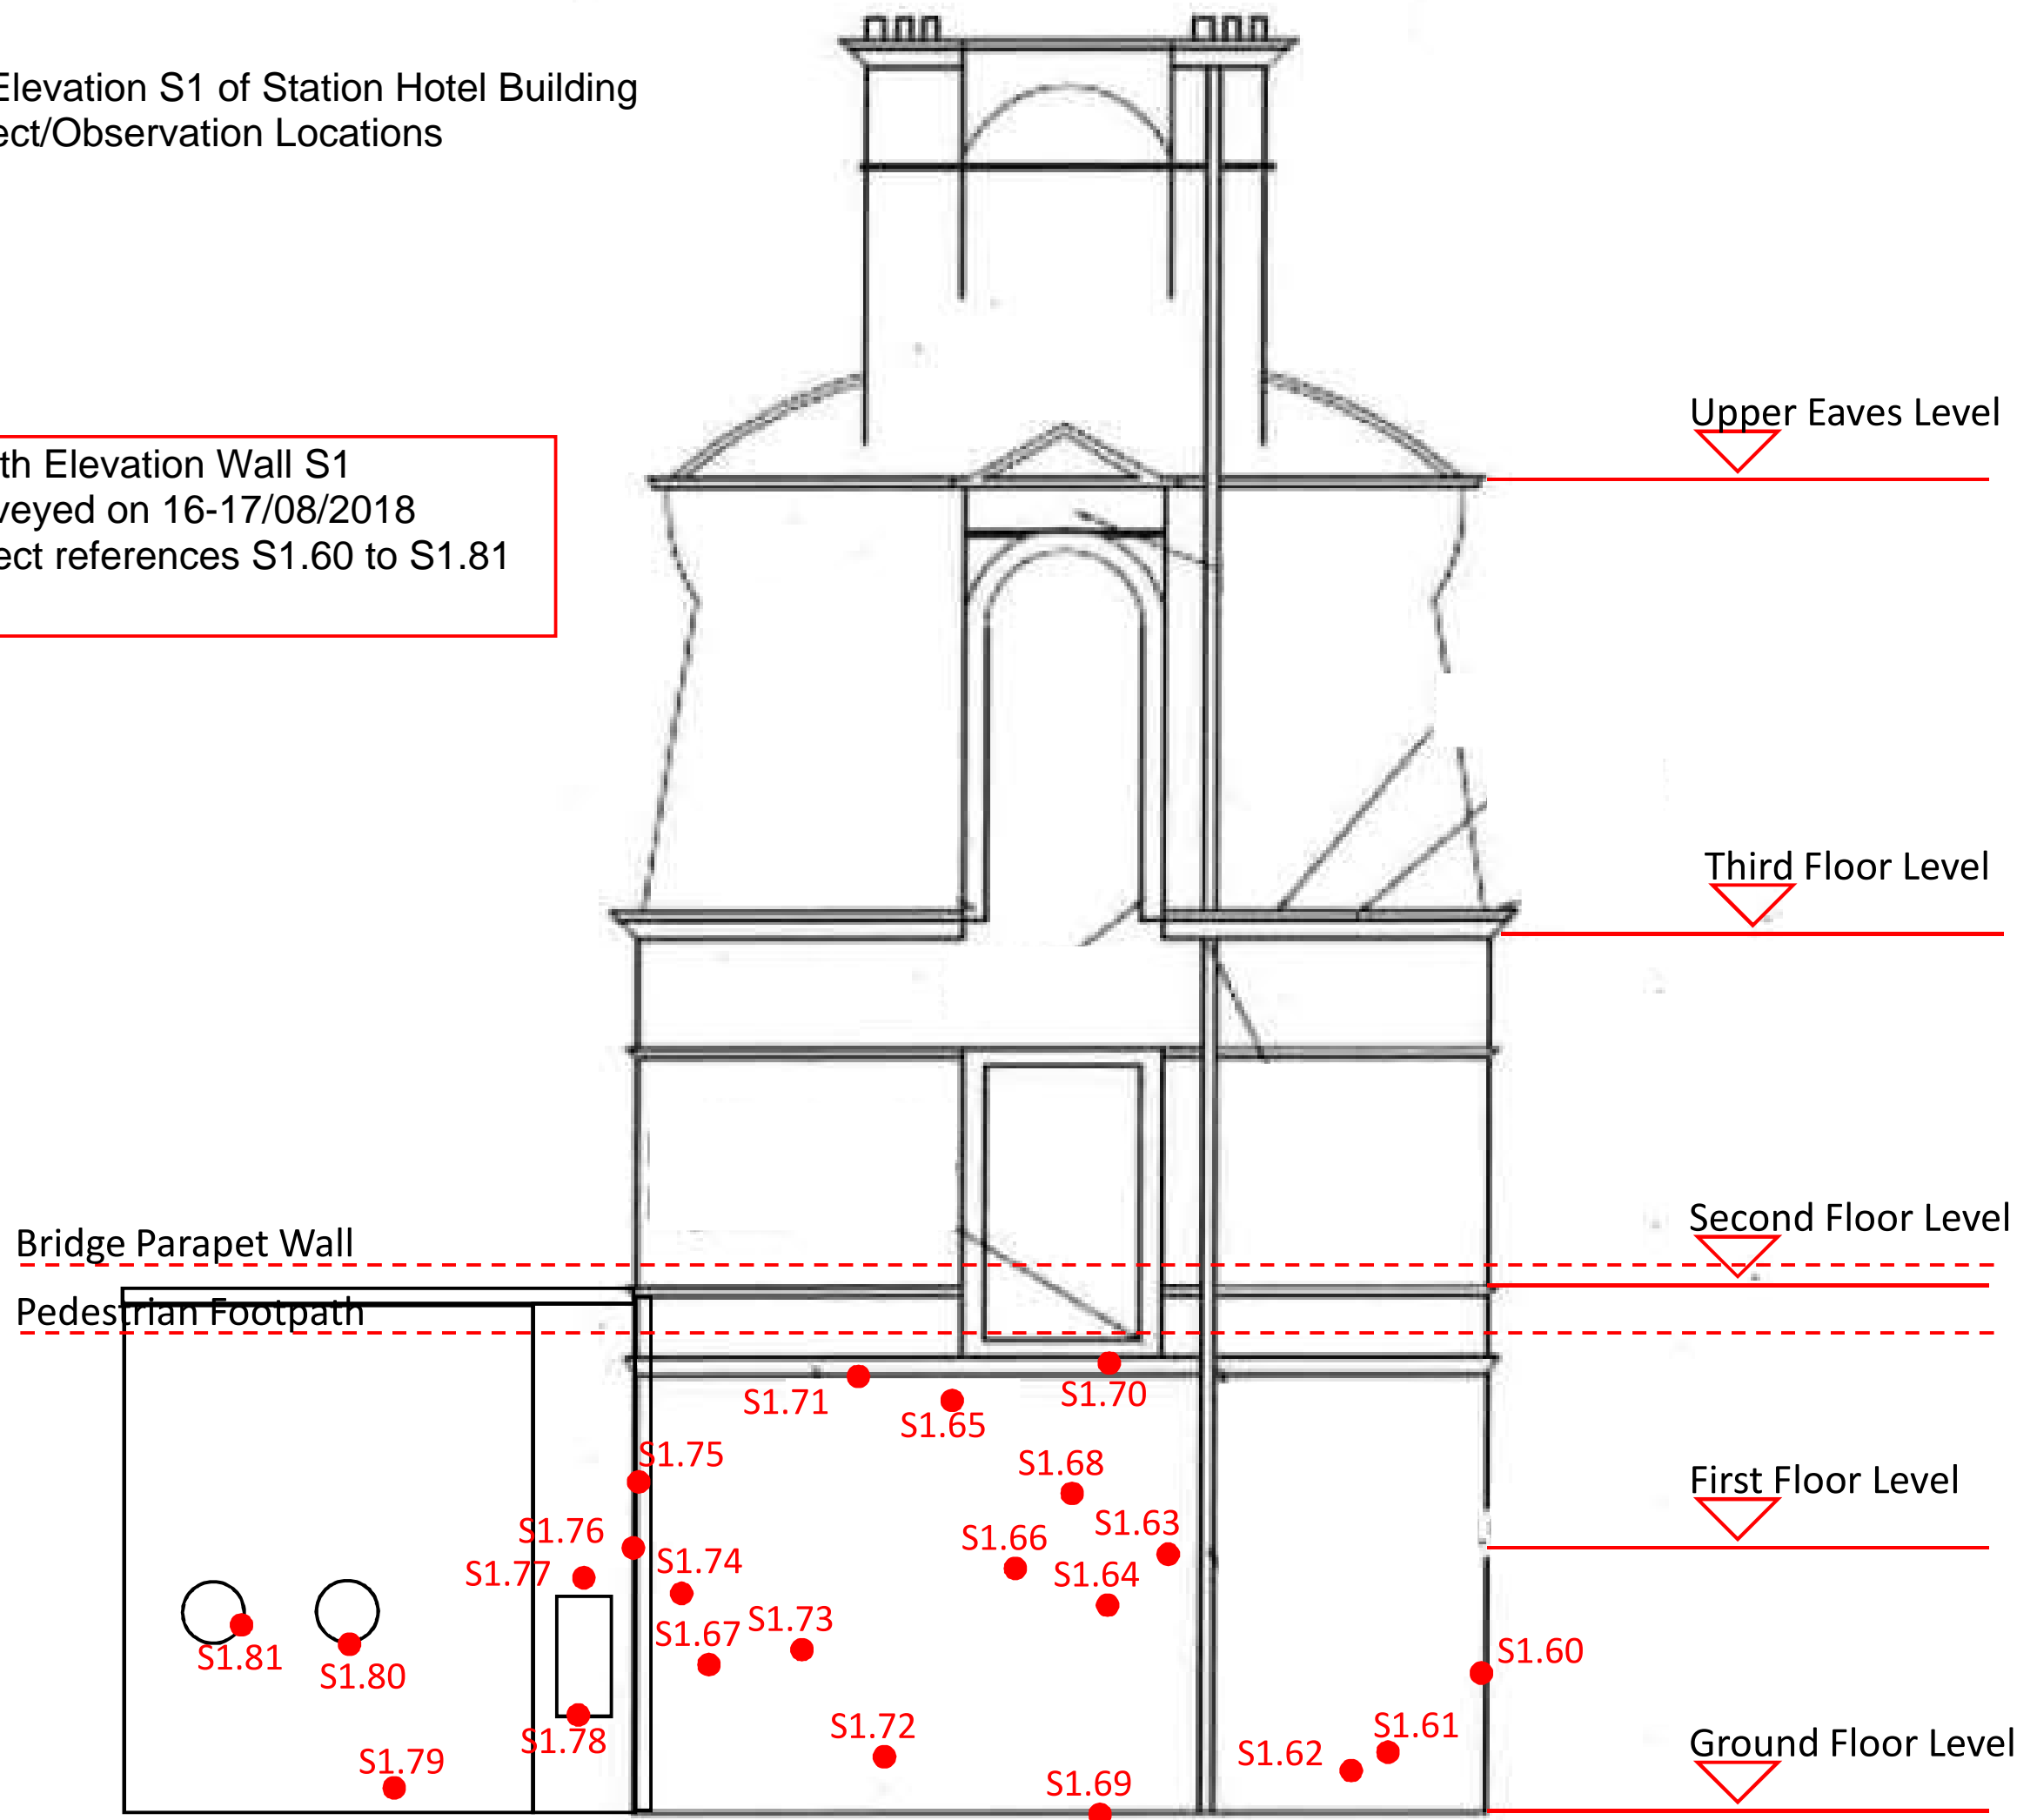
Elevation S1 of Station Hotel Building showing Defect/Observation Locations
